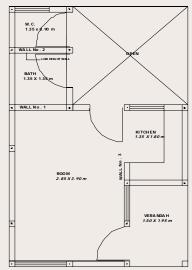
Plan of Standard House Design (One Room Unit- Plinth Area-23.75 sq.m)
